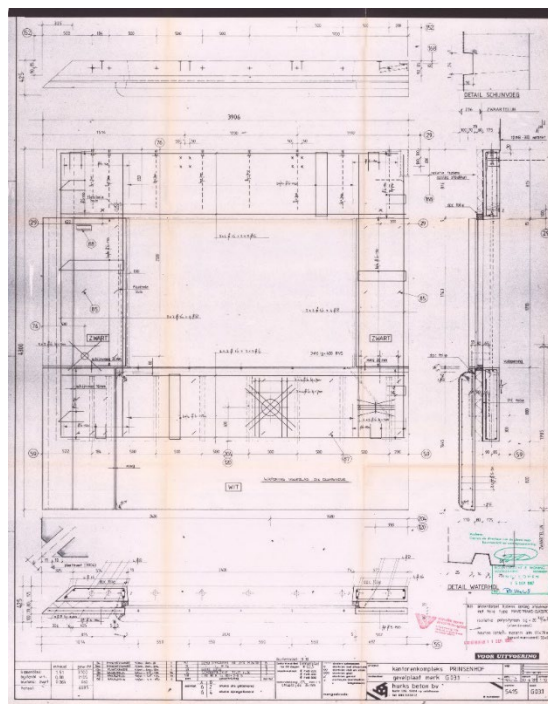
Technical drawing of a facade element (source: Hurks beton b.v.).
